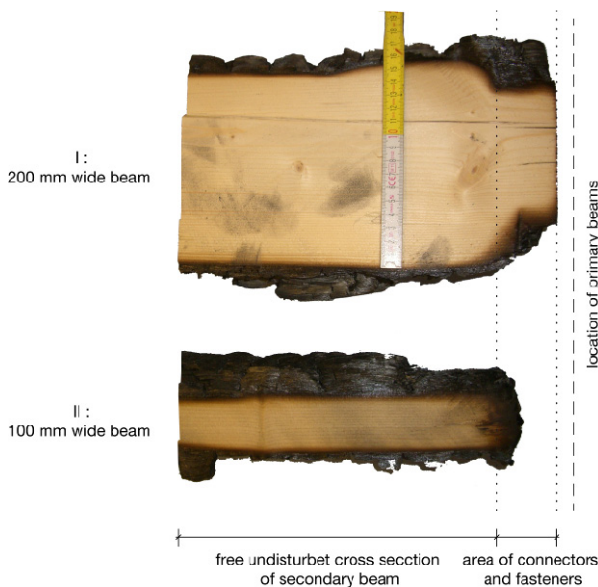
horizontal section through fire exposed secondary beams – influence of fasteners visible on the right side of the beams
